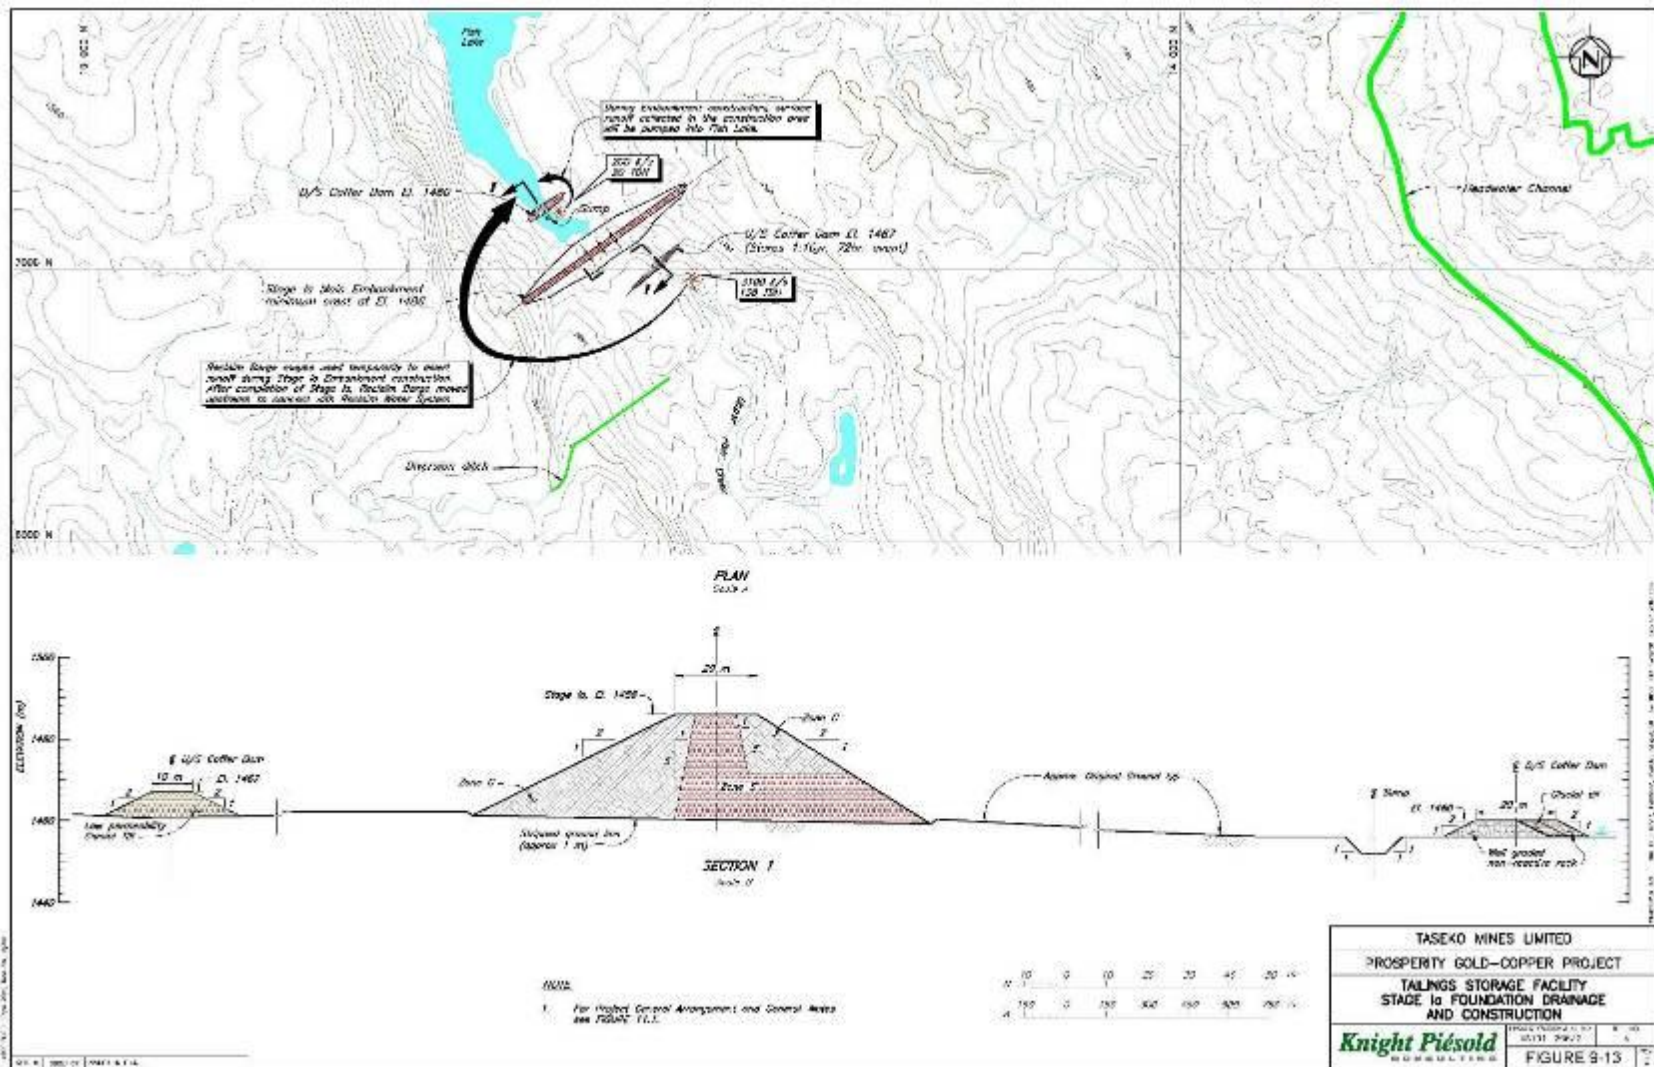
Tailings Storage Facility–Stage 1a Foundation Drainage and Construction
